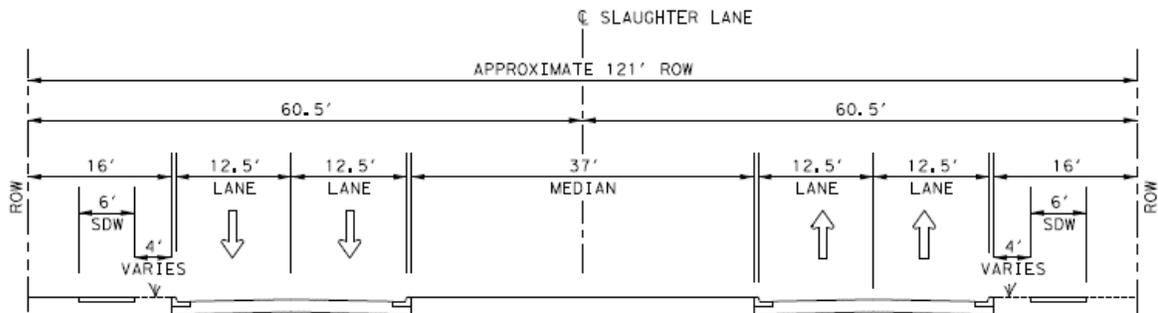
Existing Typical Section – Barstow Avenue to Escarpment Boulevard
